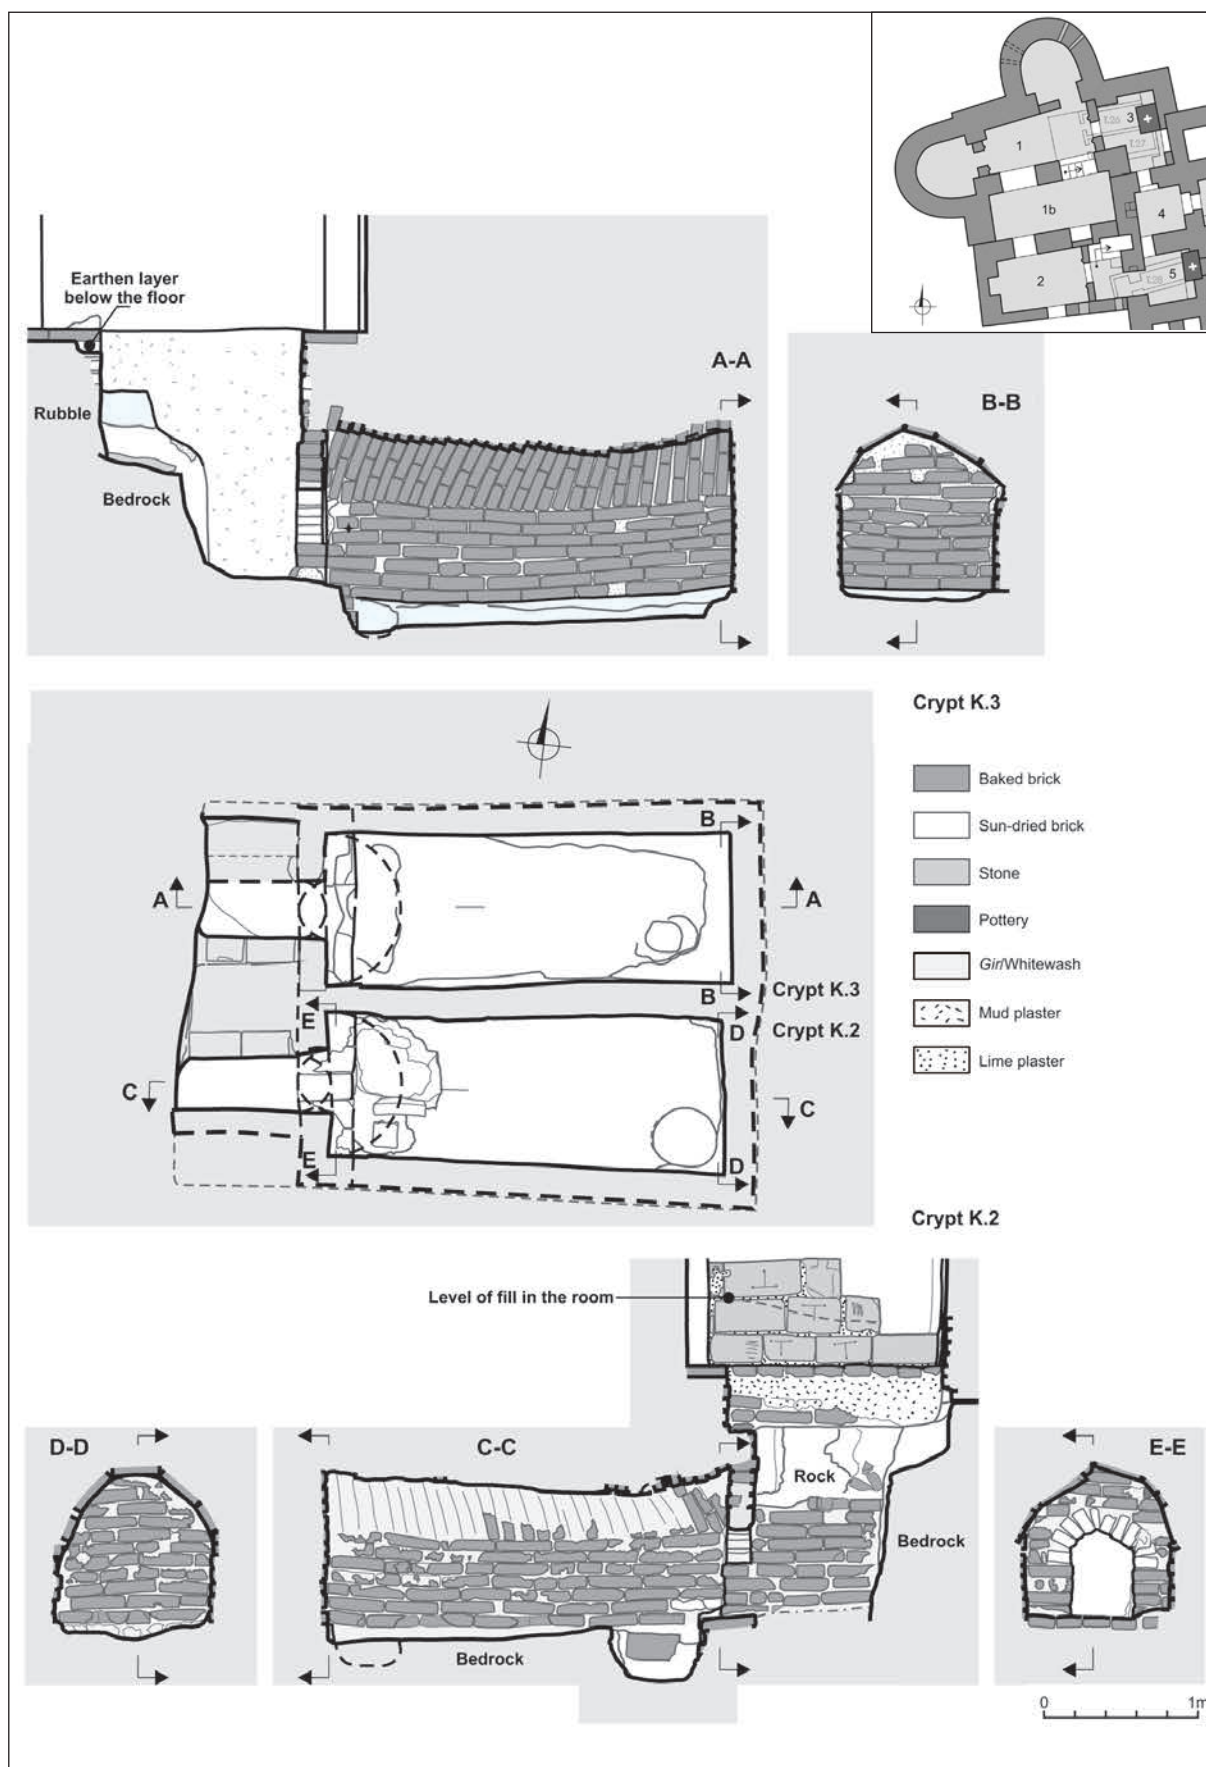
Crypts K.2 and K.3: plan and sections
